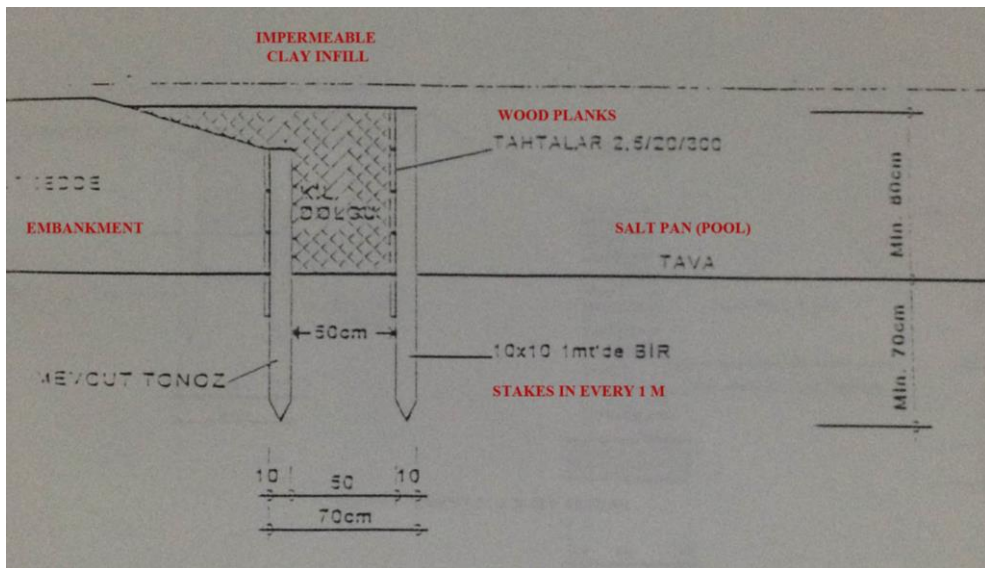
Section of an embankment supported with a border construction on salt pan side.
